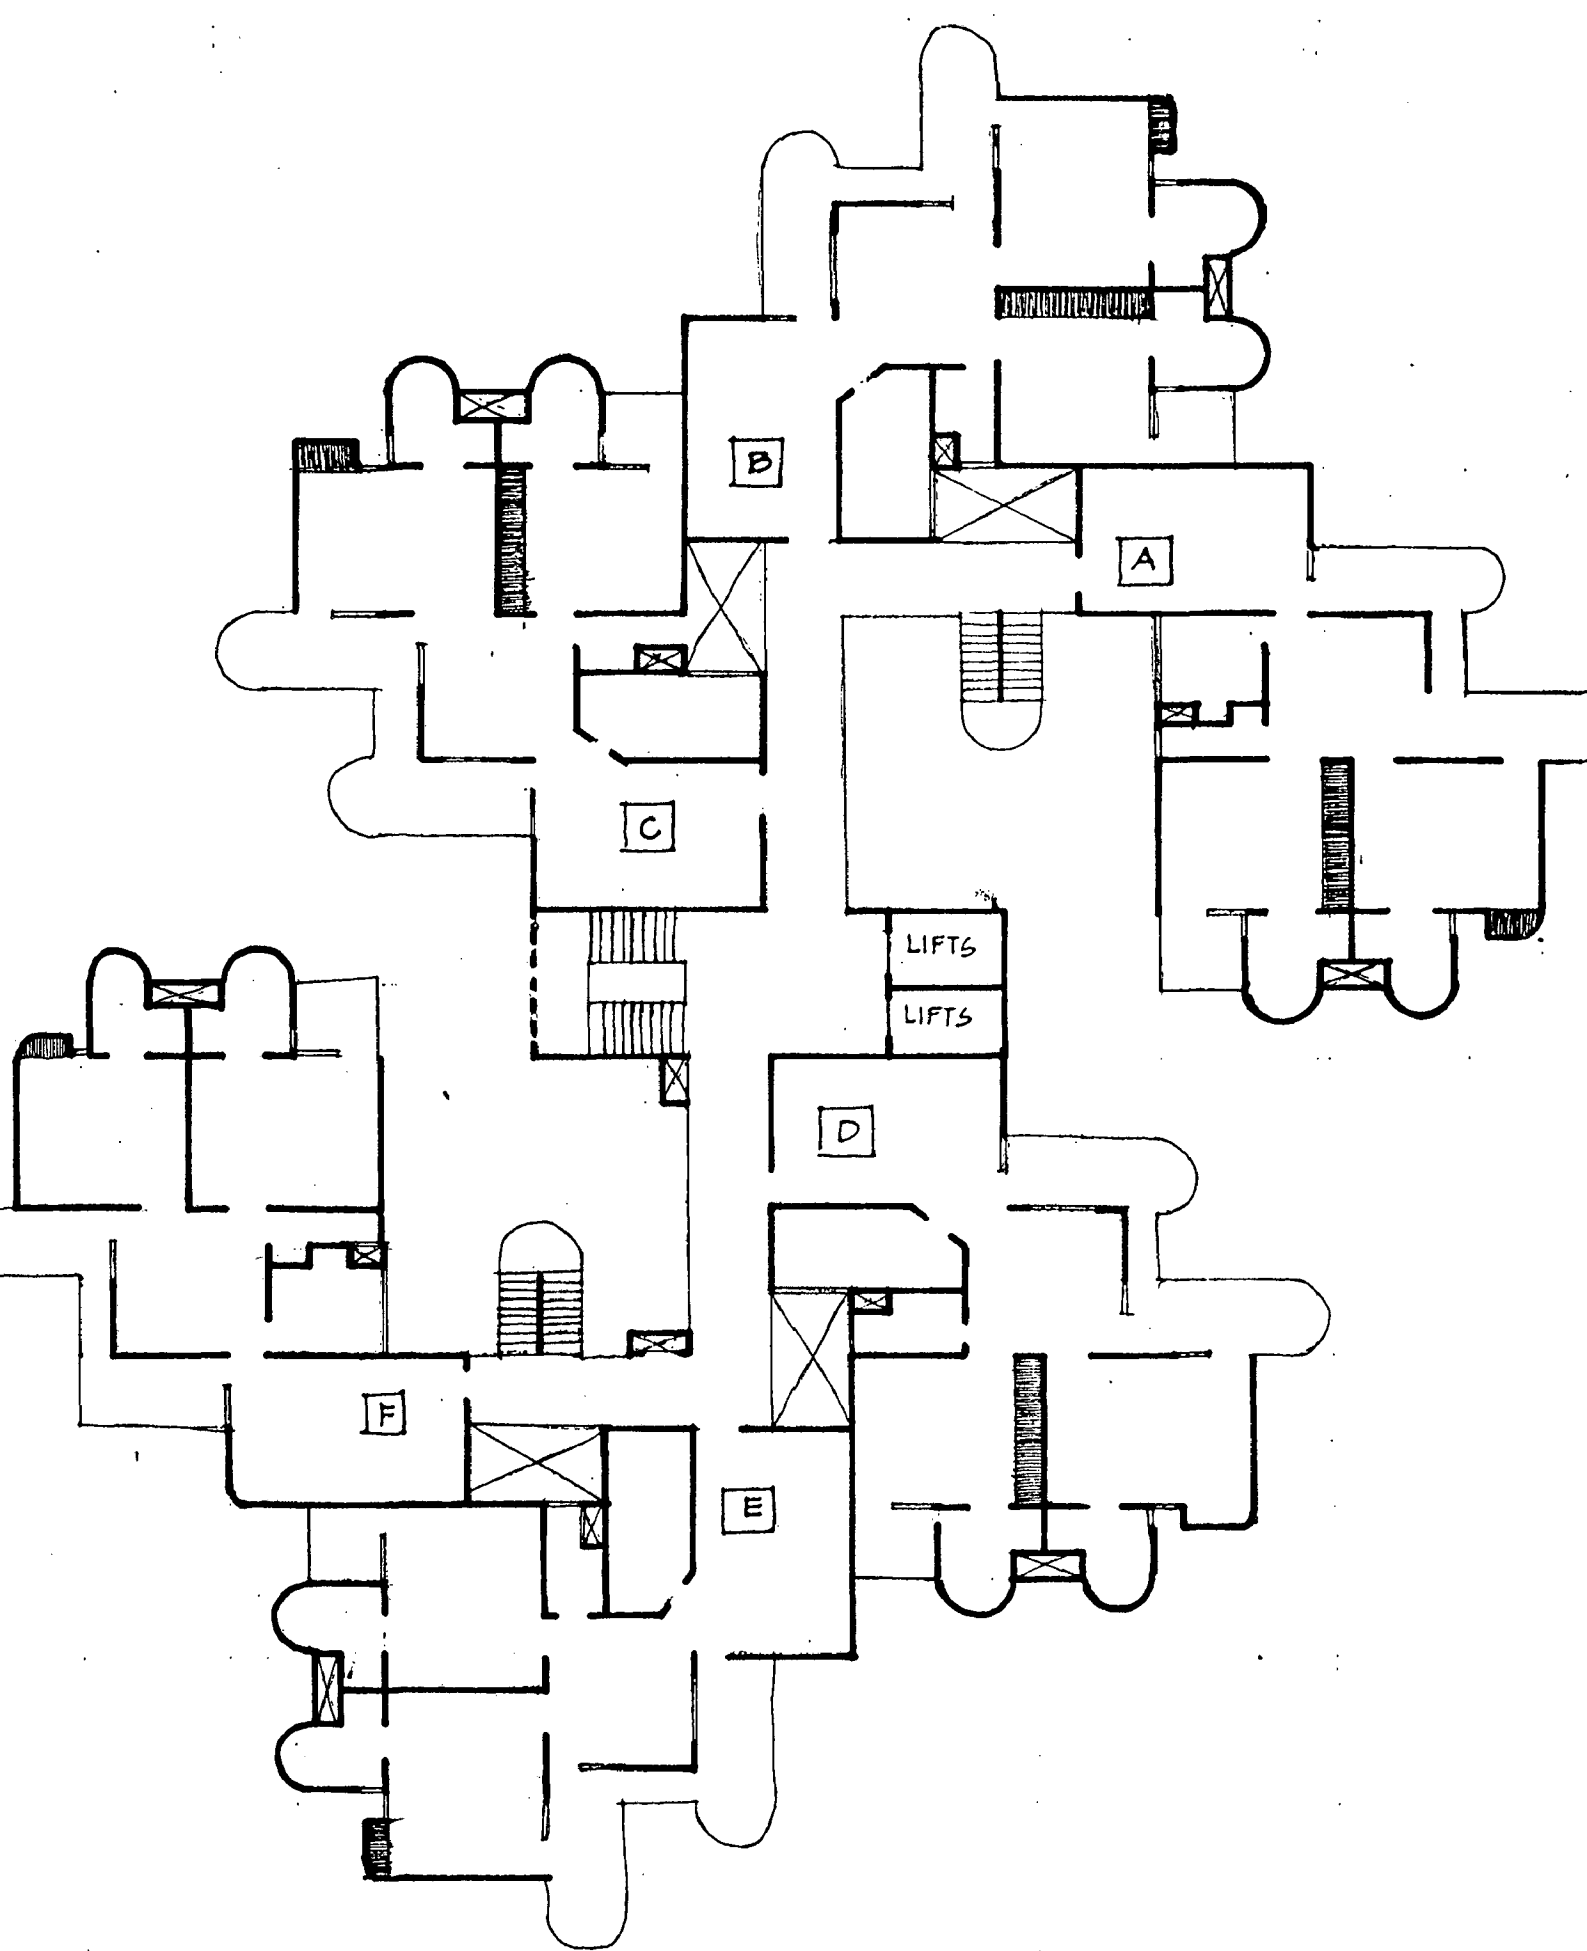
TYPICAL FLOOR PLAN - KAUSHAMBI
